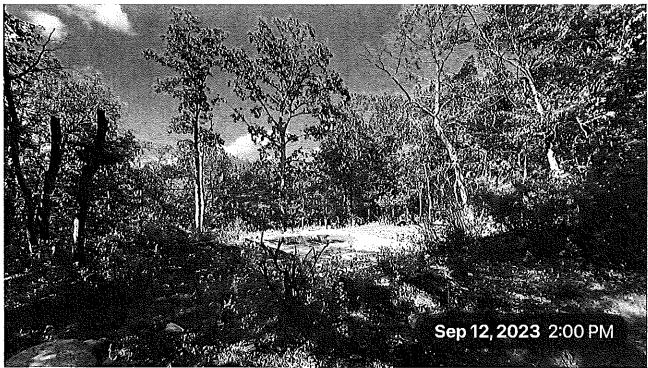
Ground view of accessory building pad, fire damaged (taken by John McDonough Associates)
